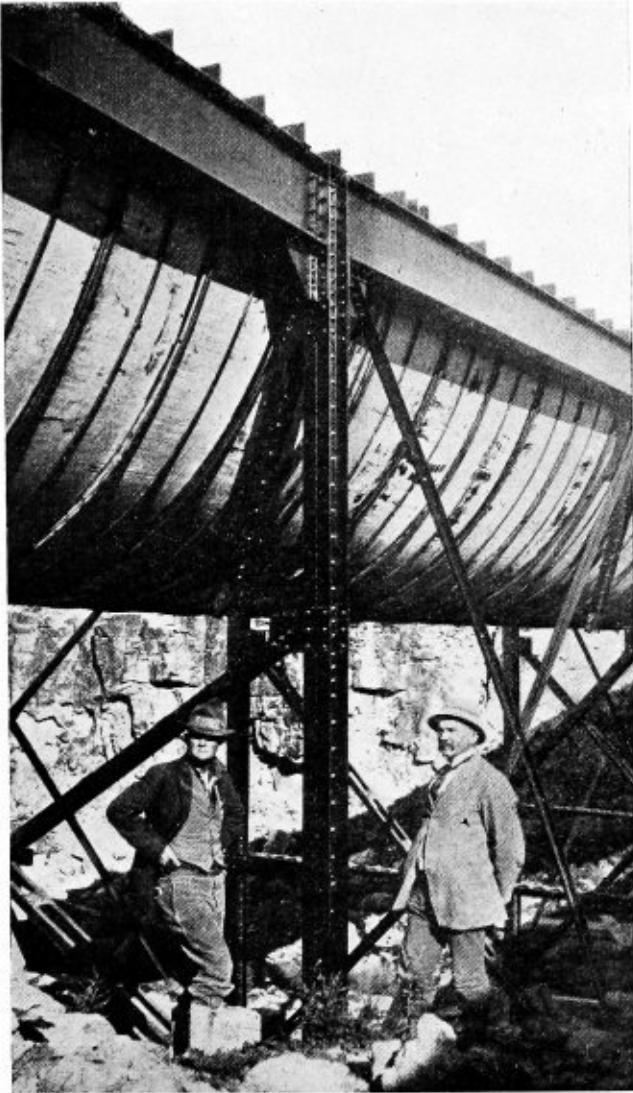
Steel Substructure of Flume of Twin Falls Canal Company, Twin Falls, Ida.
